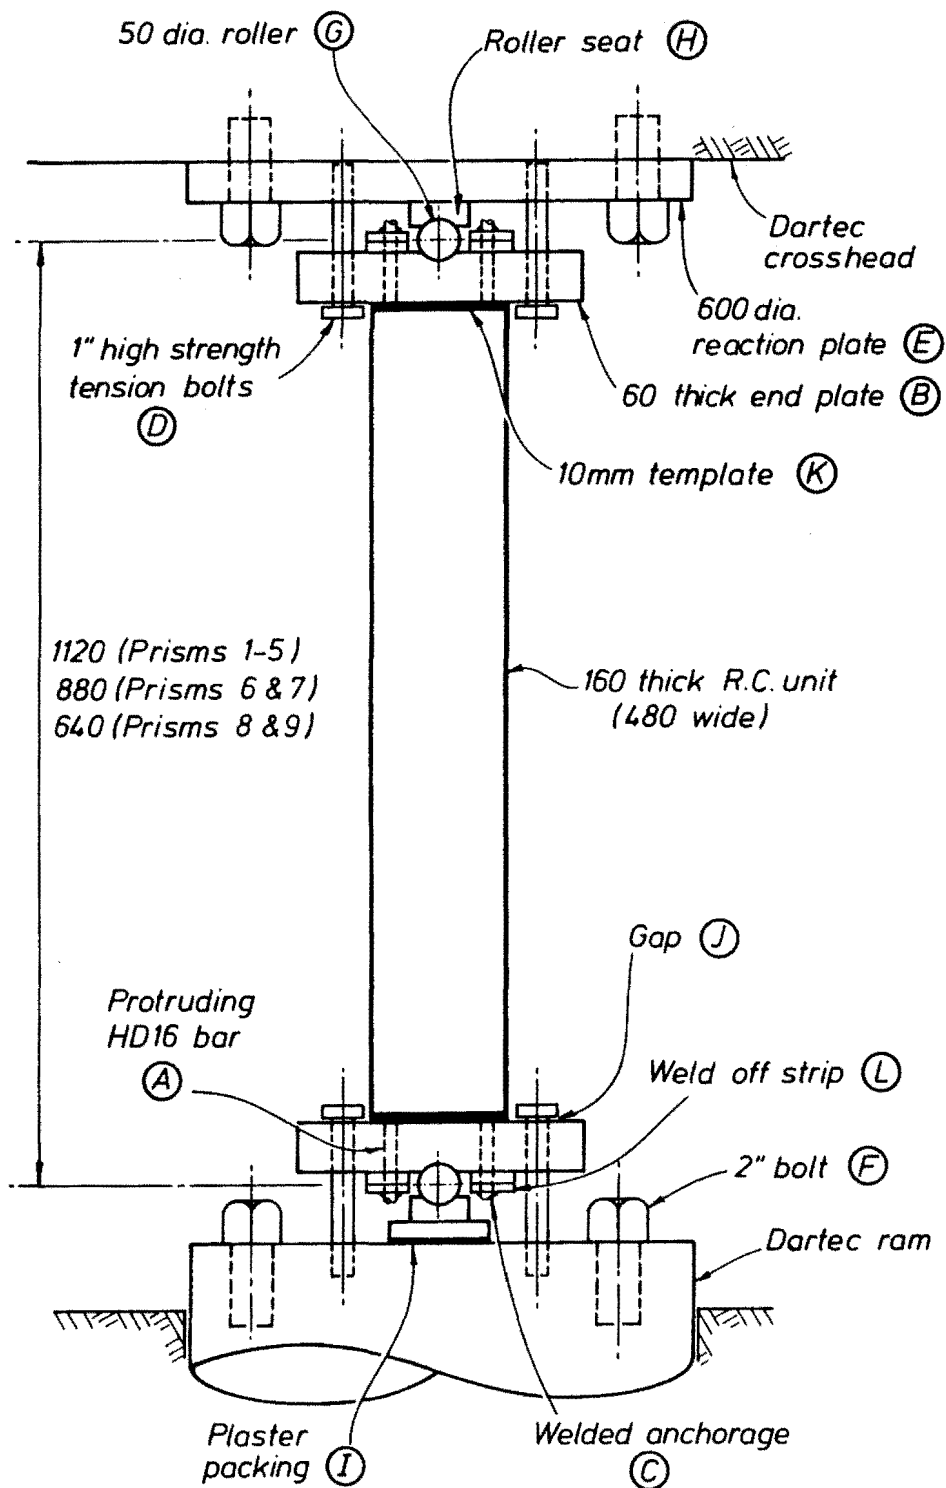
Elevation Showing the Prism Testing Assembly.
